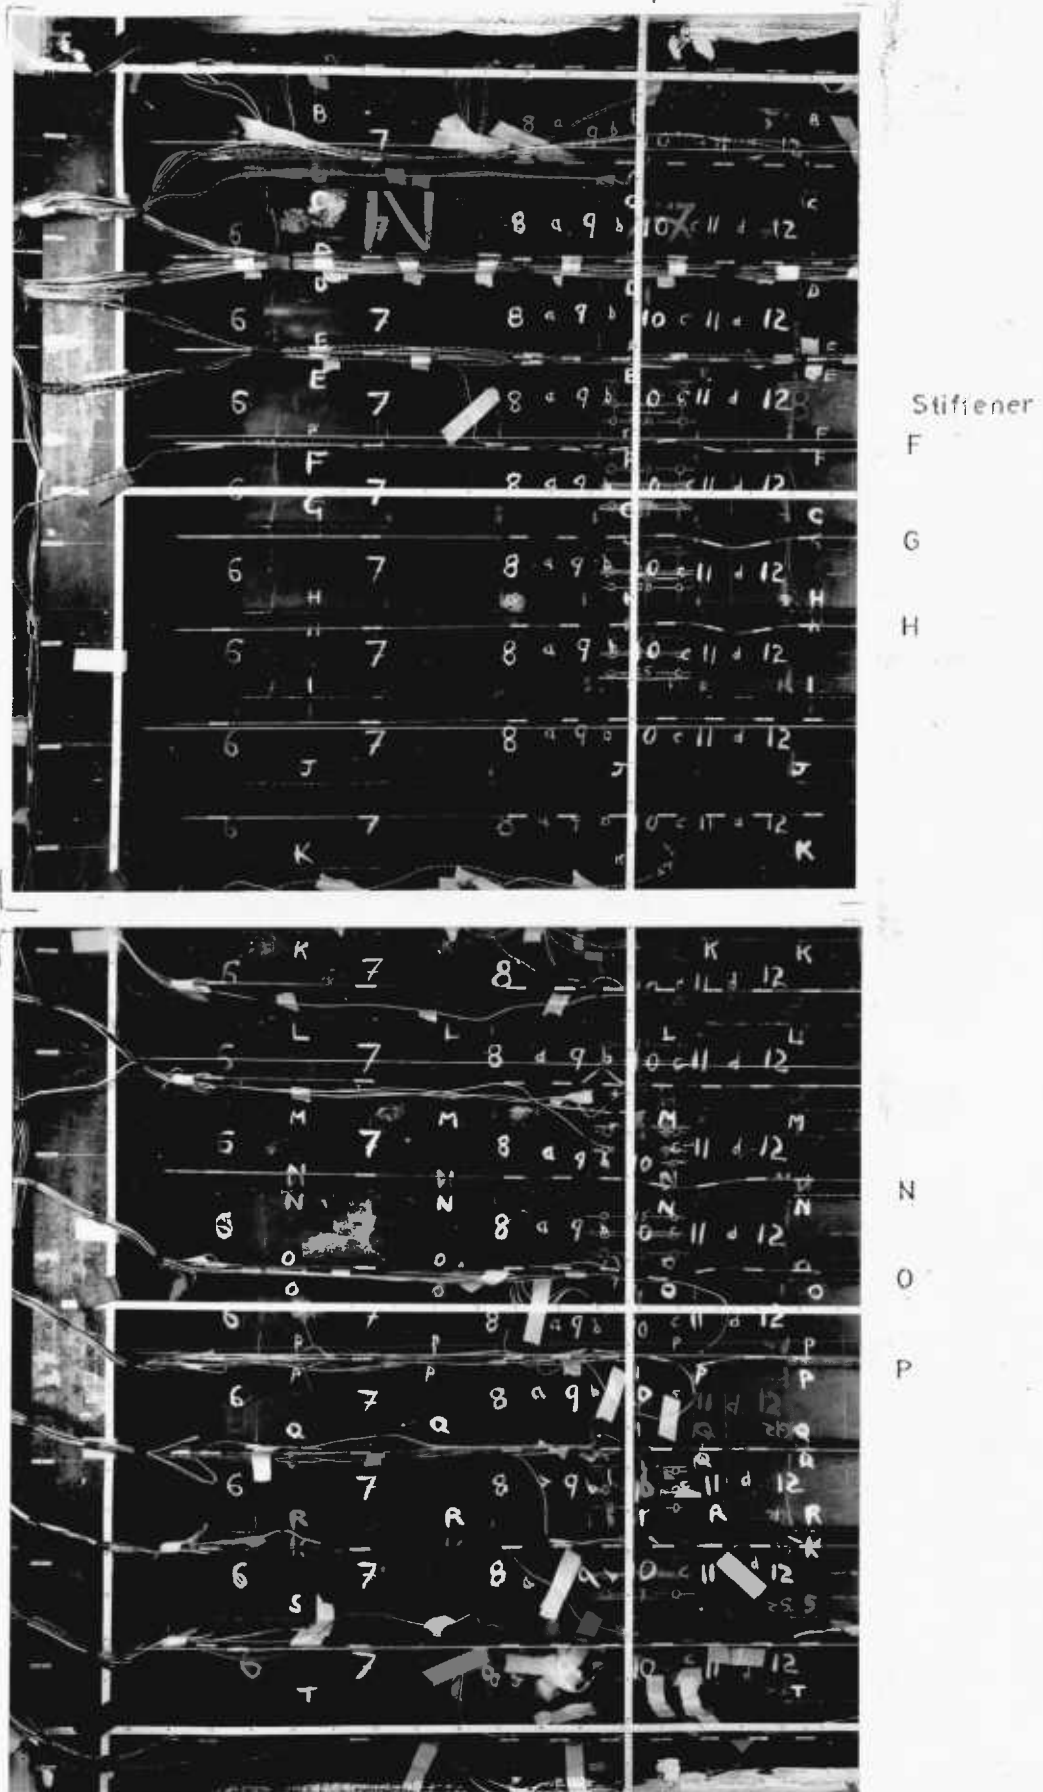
Model 12 - view of underside of central bay showing failure of stiffeners F, G, H, N, O and P (Test 12C - at 4540 kN point load)
